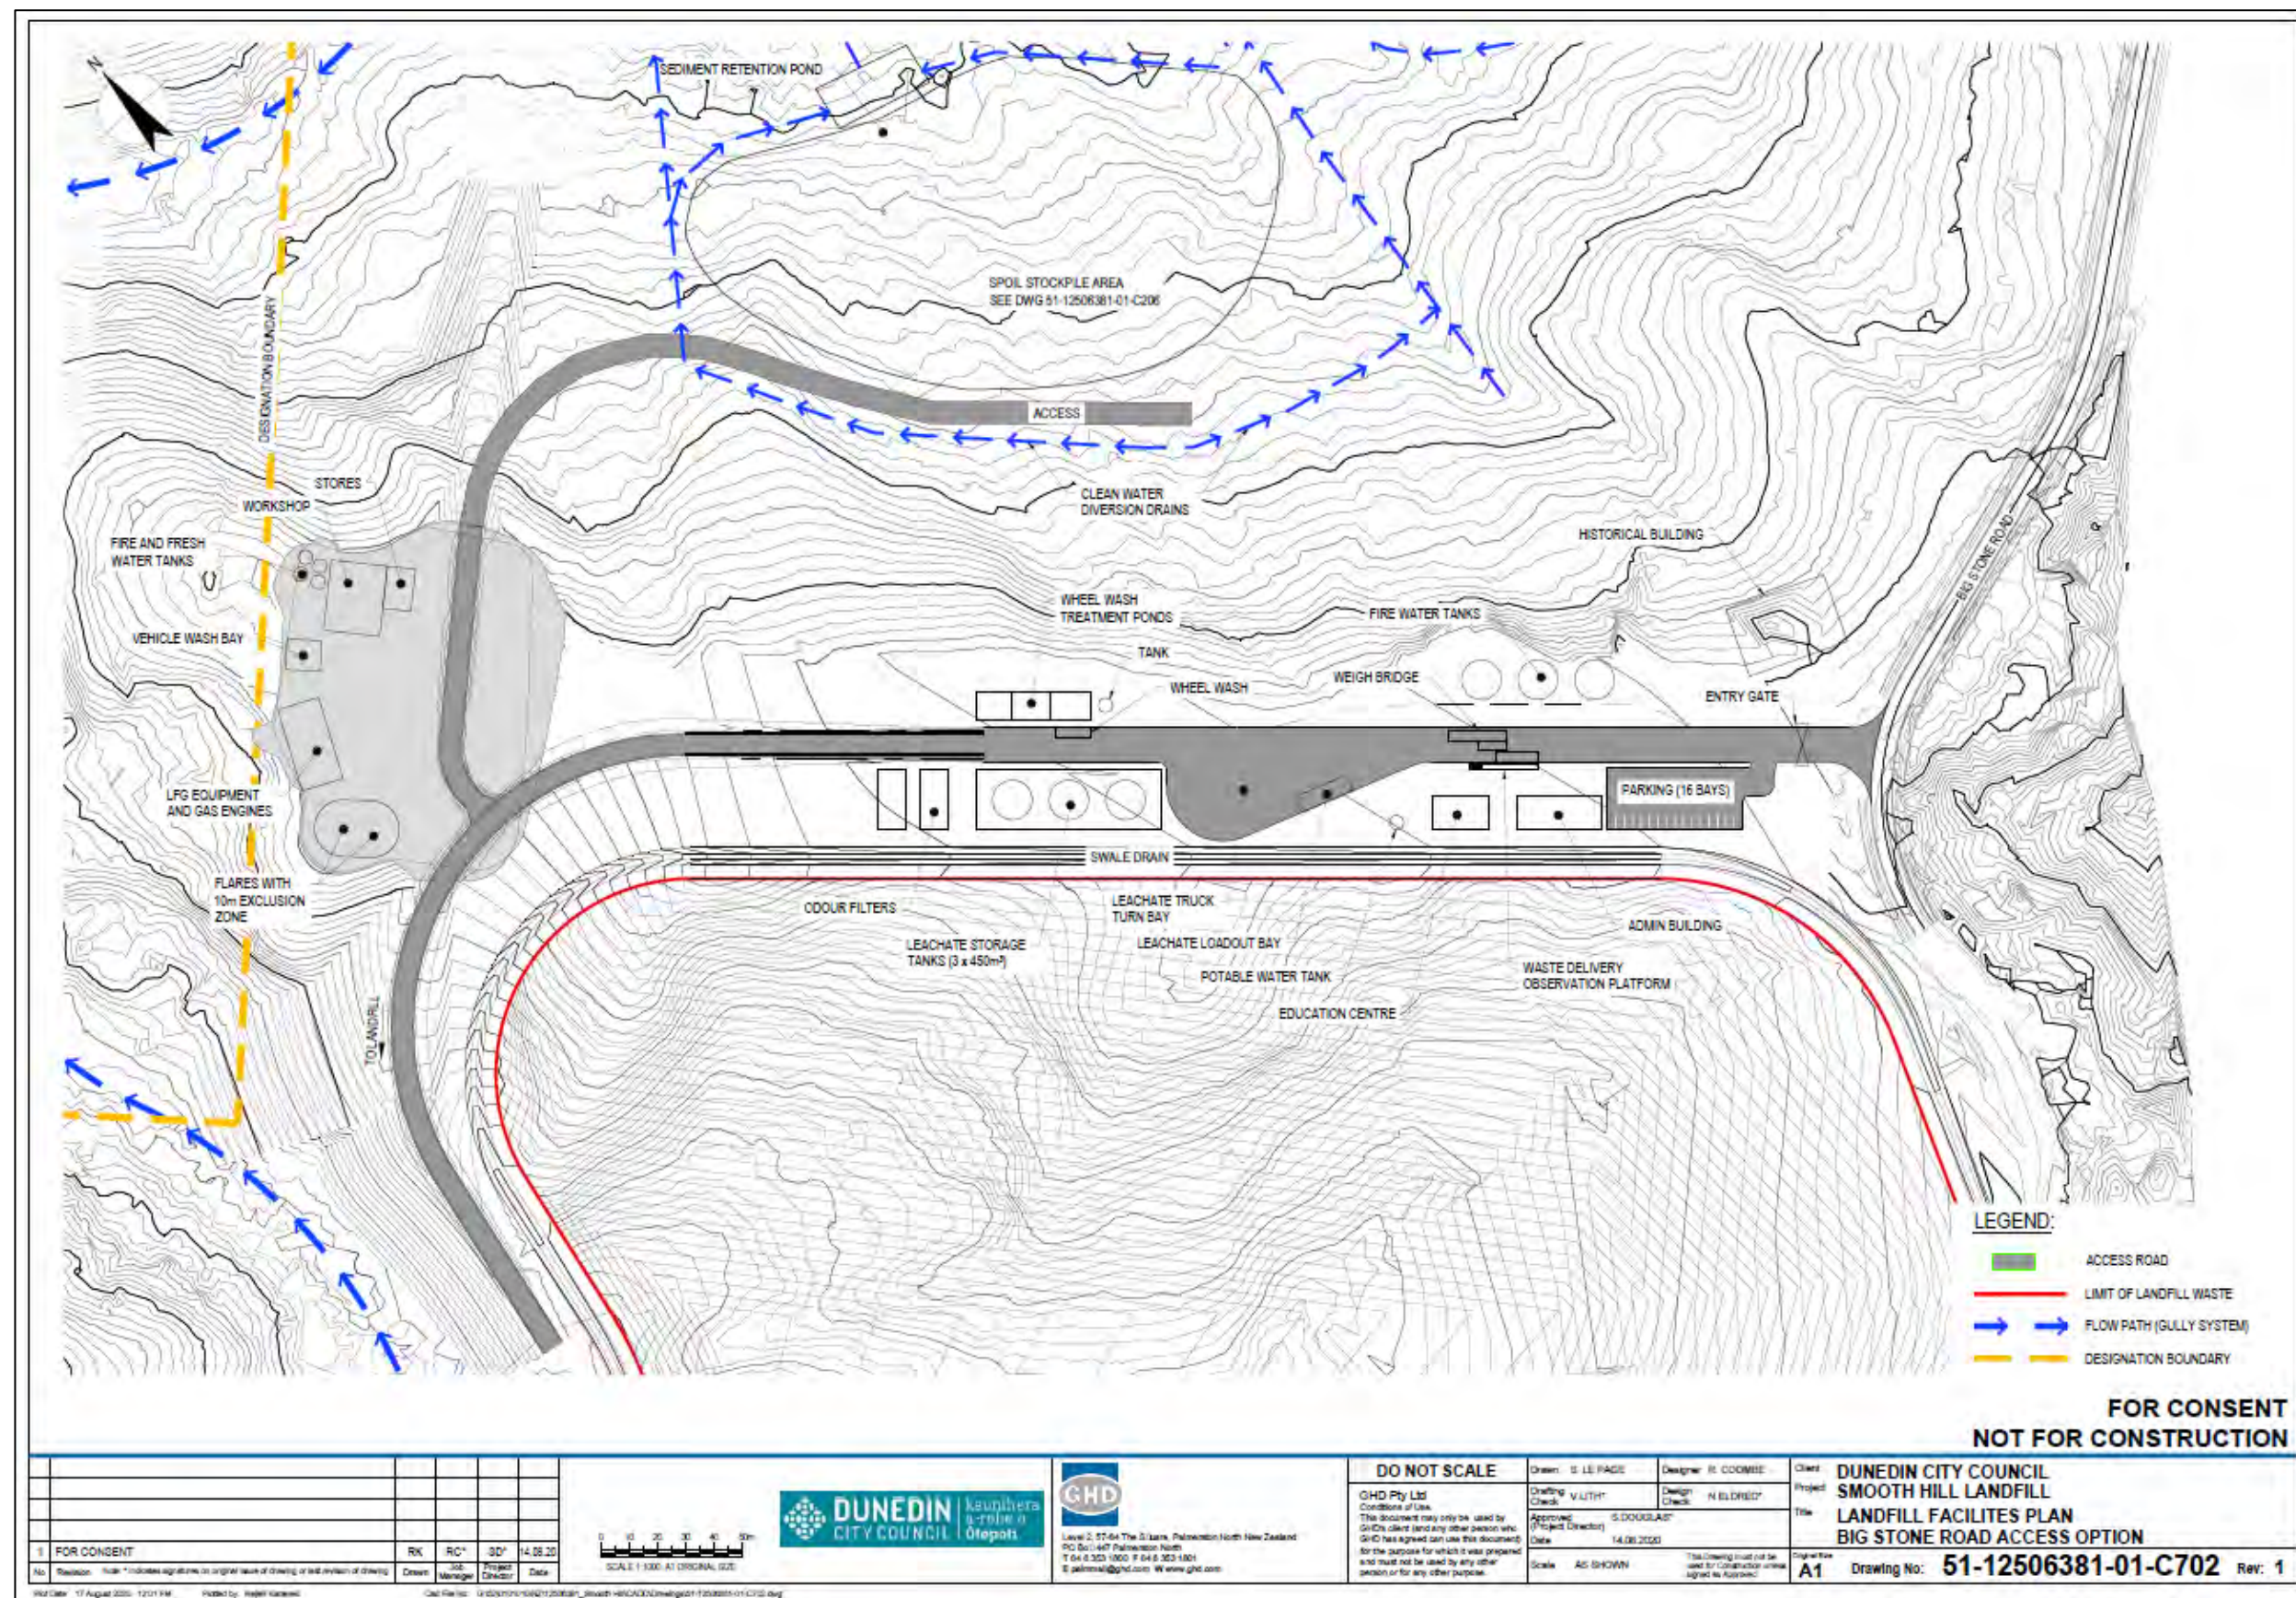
Plans provided by Boffa Miskell showing the proposed landfill facilities at the northeast extent of the landfill extent.
